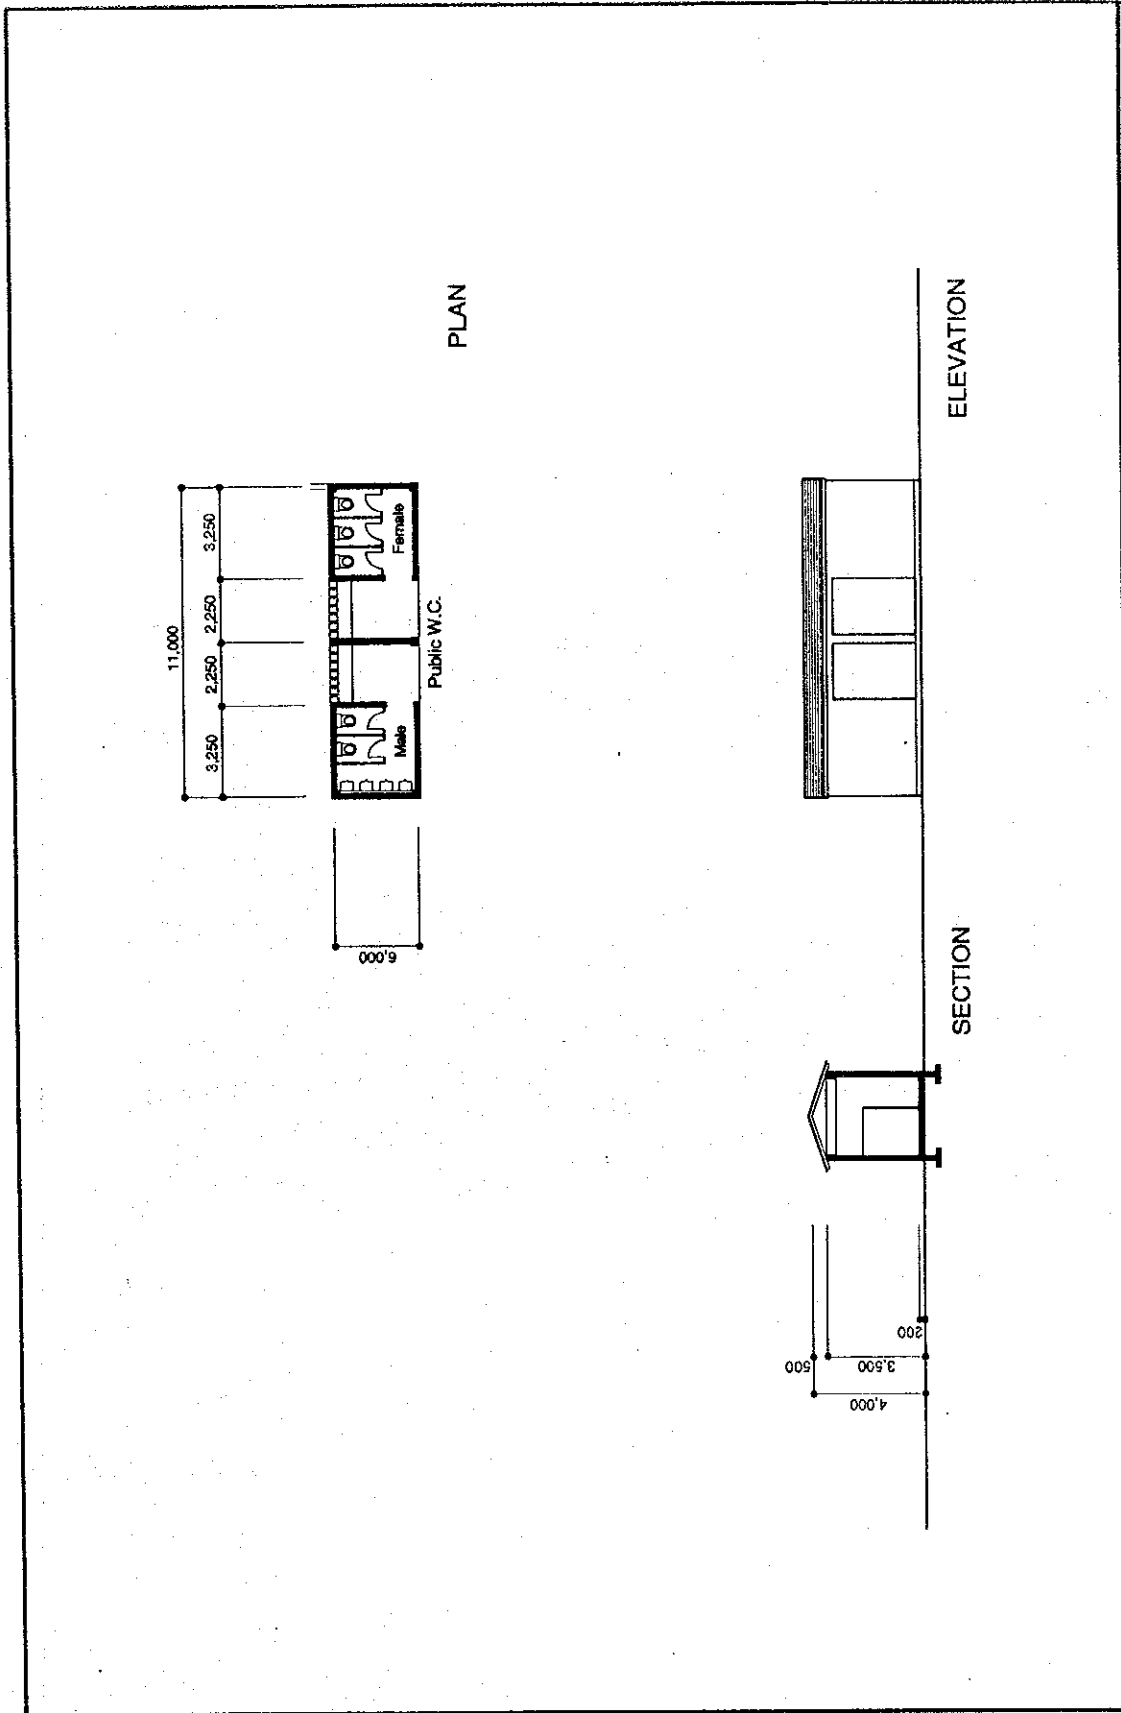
Public W.C. in C/D Center - Pampa Grande Plan / Elevation / Section S = 1 / 250
